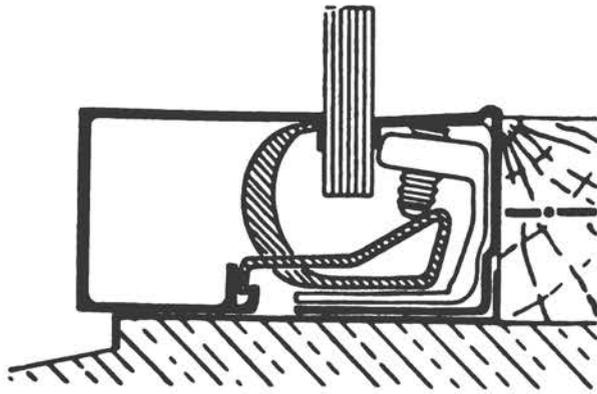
Typical Glazing Molding. (Courtesy of Kawneer Co.)
